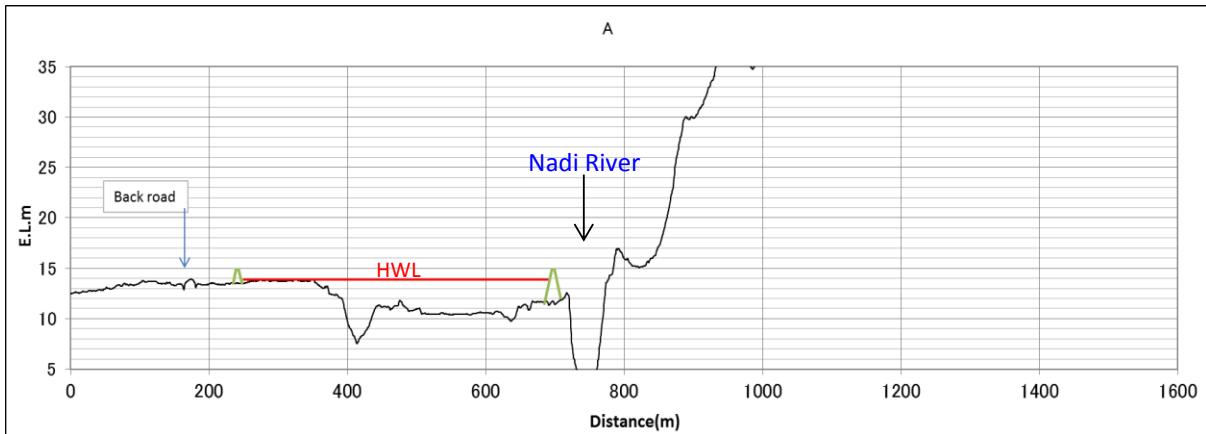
Cross Section of Retarding Basin A (Left bank)
